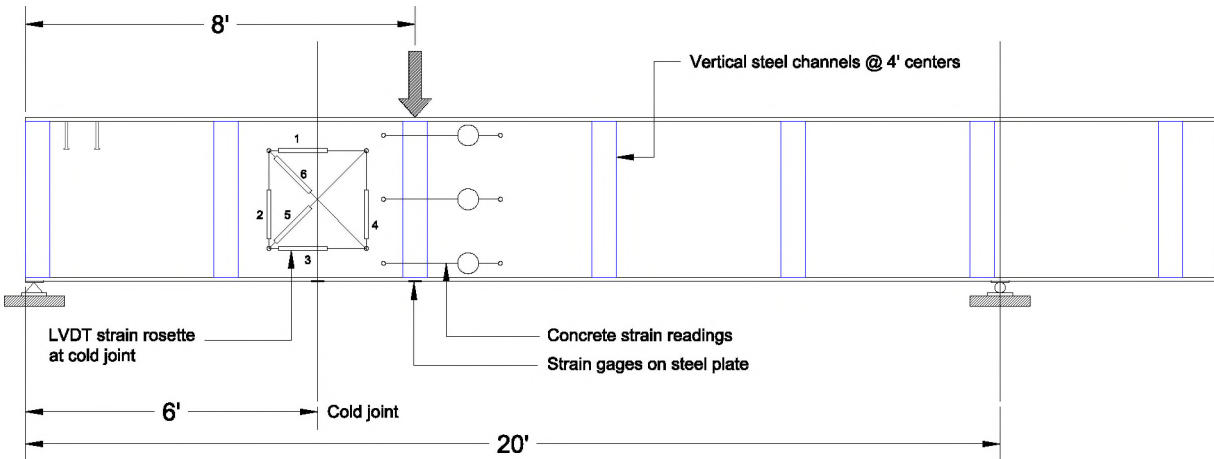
Task 4 specimen, test configuration and instrumentation.
